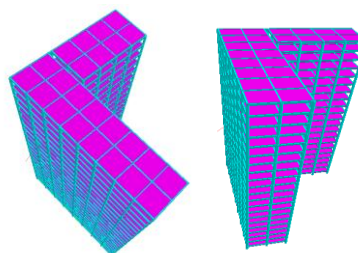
(c) L-Shape G+20 and G+22 Building with architectural relief
